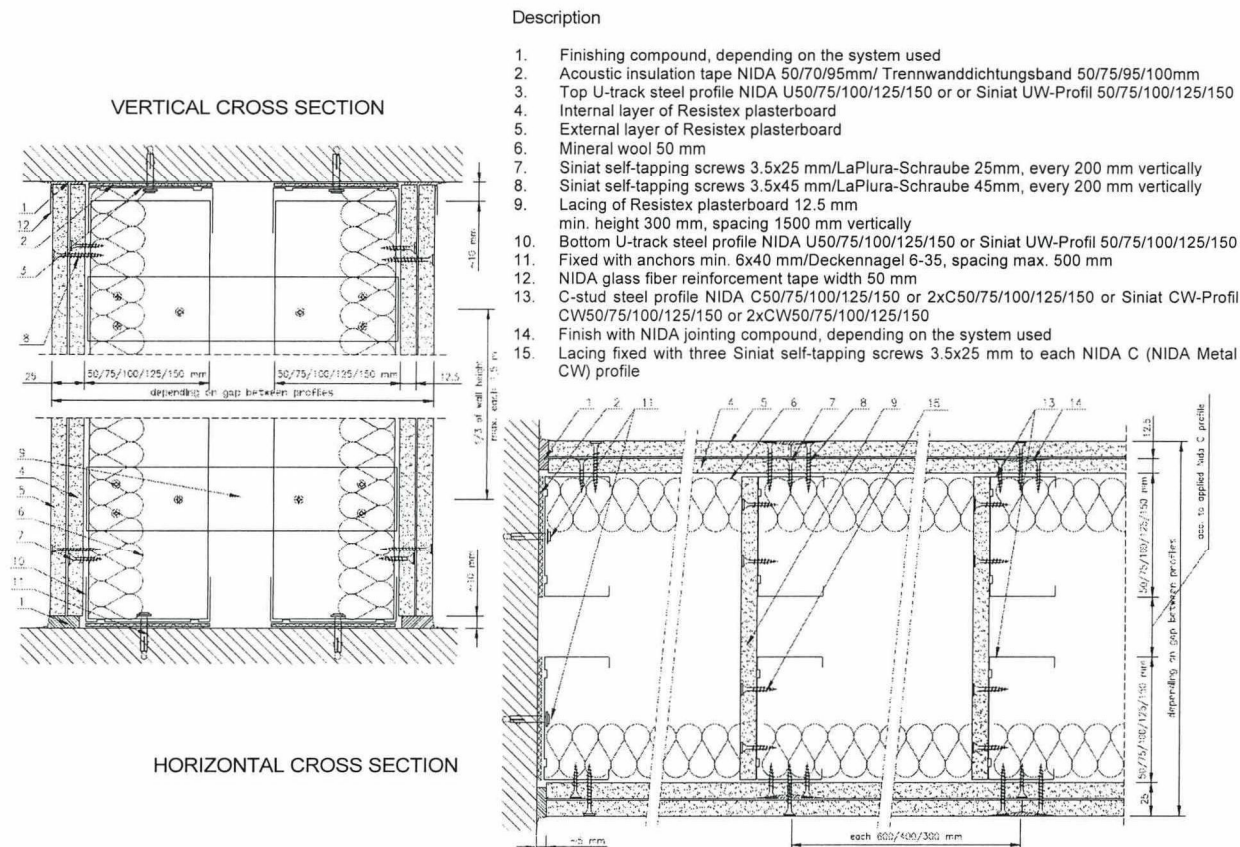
Vertical and horizontal cross-section of anti-burglar non-loadbearing partition wall with double framework and two layers of boards – for installations.
